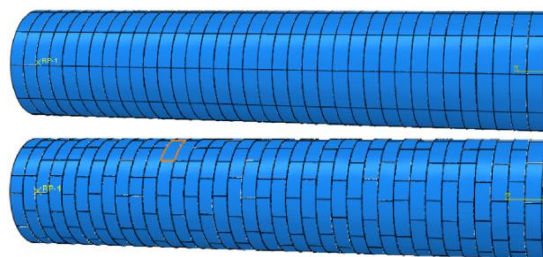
Straight-jointed assembly (top); stagger-jointed assembly (bottom) (Yu et al., 2019)
